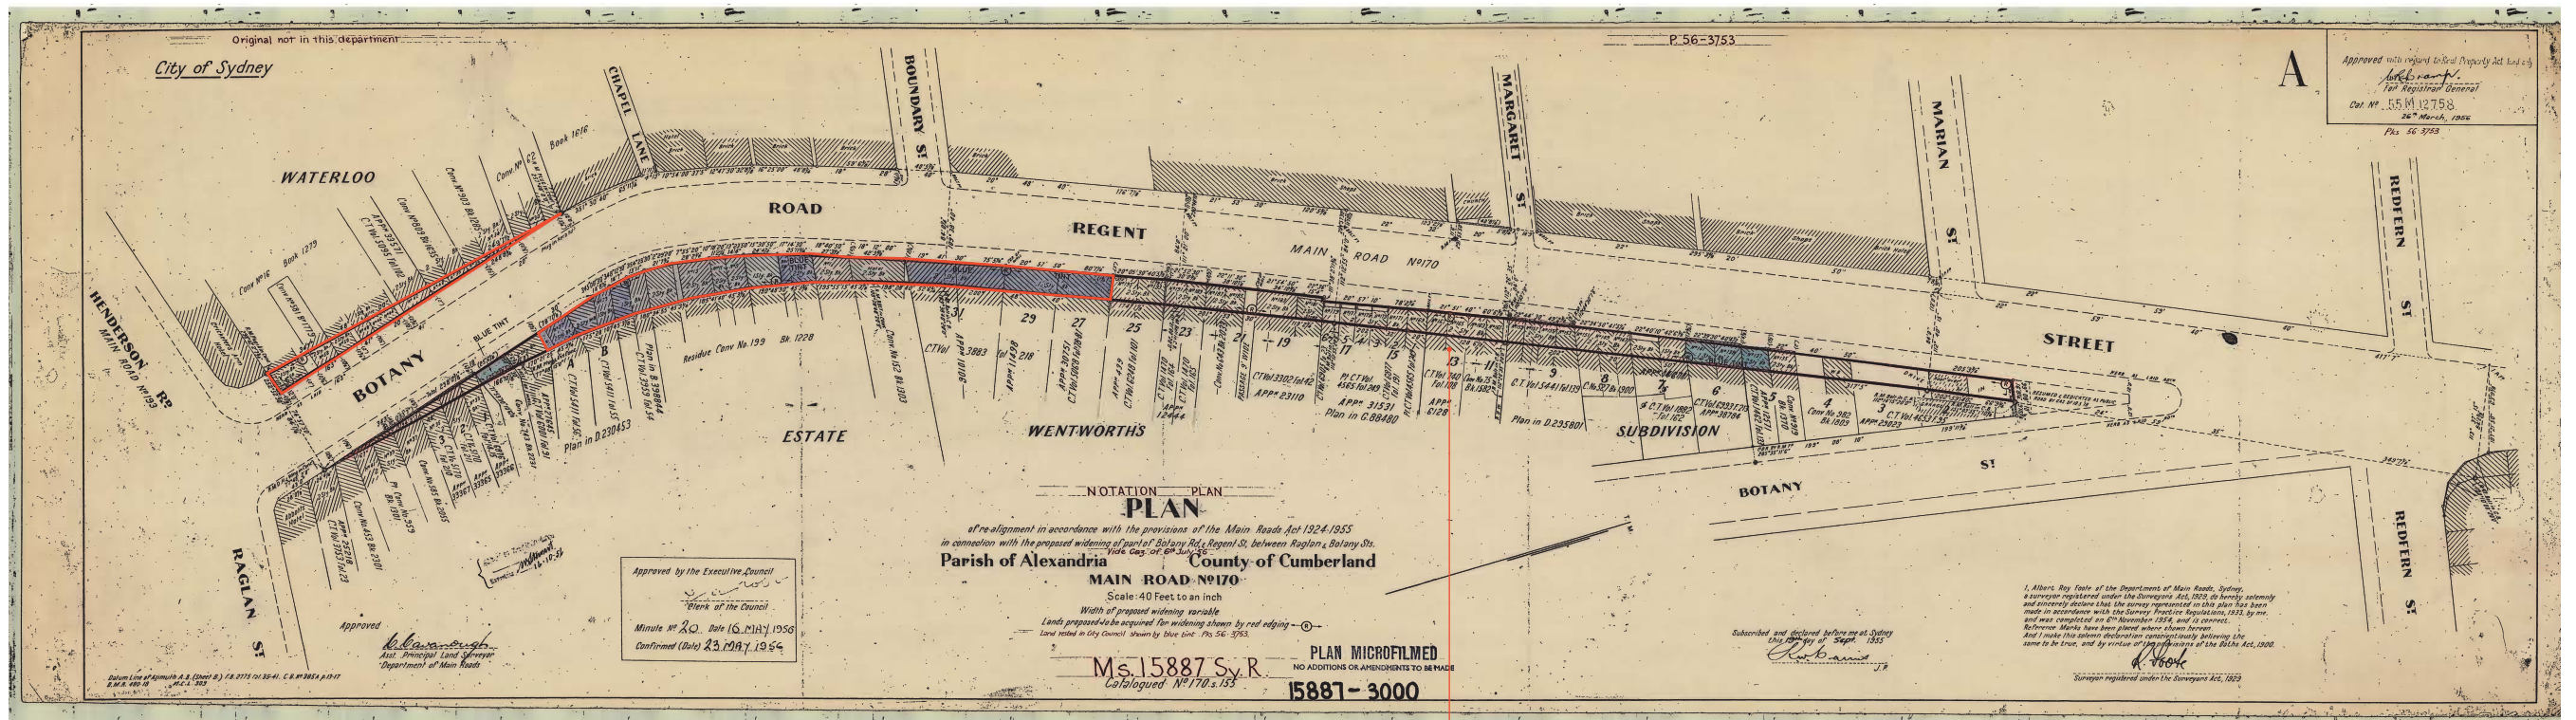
1956 Crown Plan 15887-3000 showing proposed Botany Road widening.
